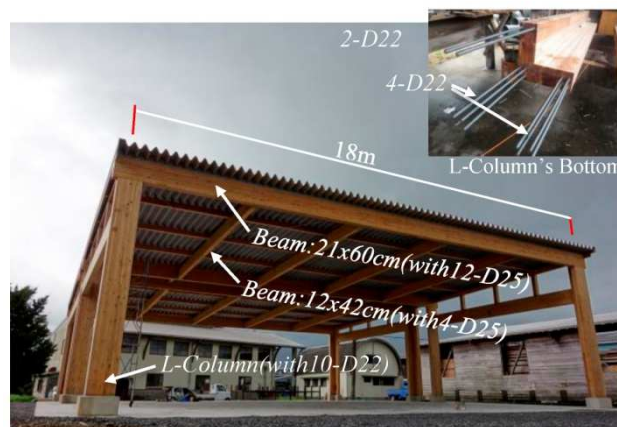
The first prototype building, “Samurai”, utilizing glulam timber reinforced using deformed steel bars and epoxy resin adhesives (RGTSB)(75)
